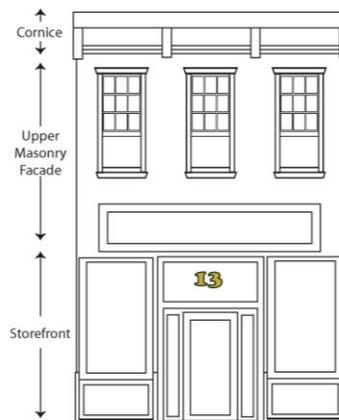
04-7: The typical façade found within downtown Defiance.
